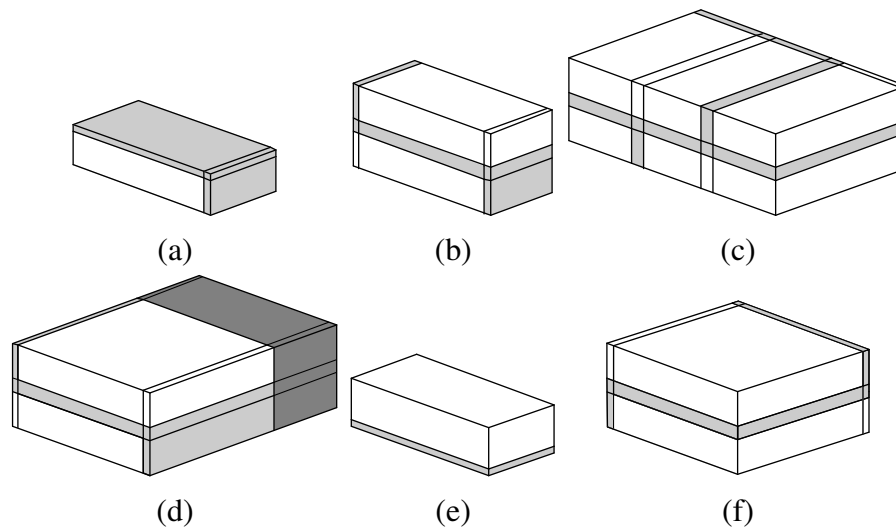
Discretization of periodic unit cells: (a) stack bond wall, (b) running bond wall, (c) Flemish bond wall, (d) three-leaf wall, (e) stack bond pillar and (f) English bond pillar.
